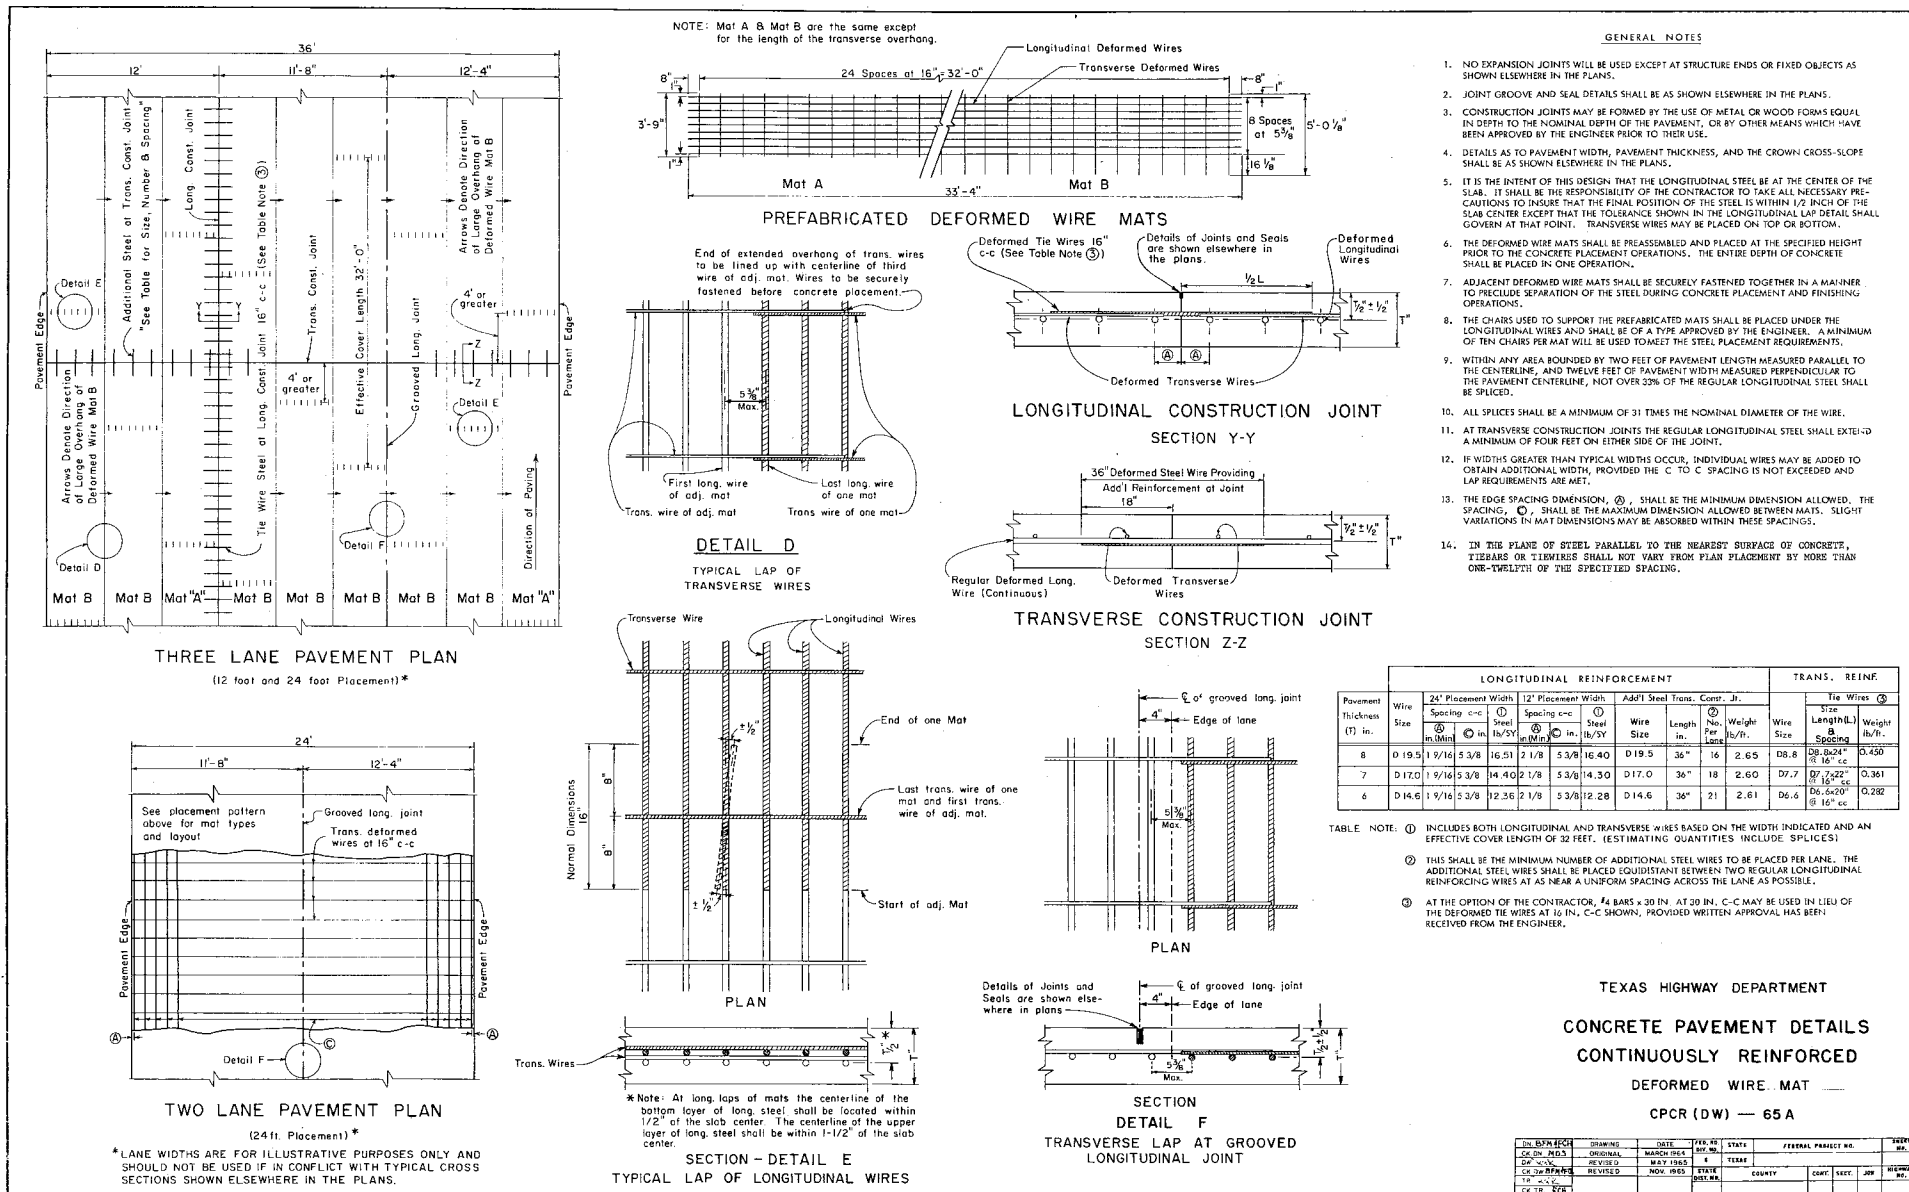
TEXAS HIGHWAY DEPARTMENT CONCRETE PAVEMENT DETAILS, CONTINUOUSLY REINFORCED (DEFORMED WIRE MAT)
